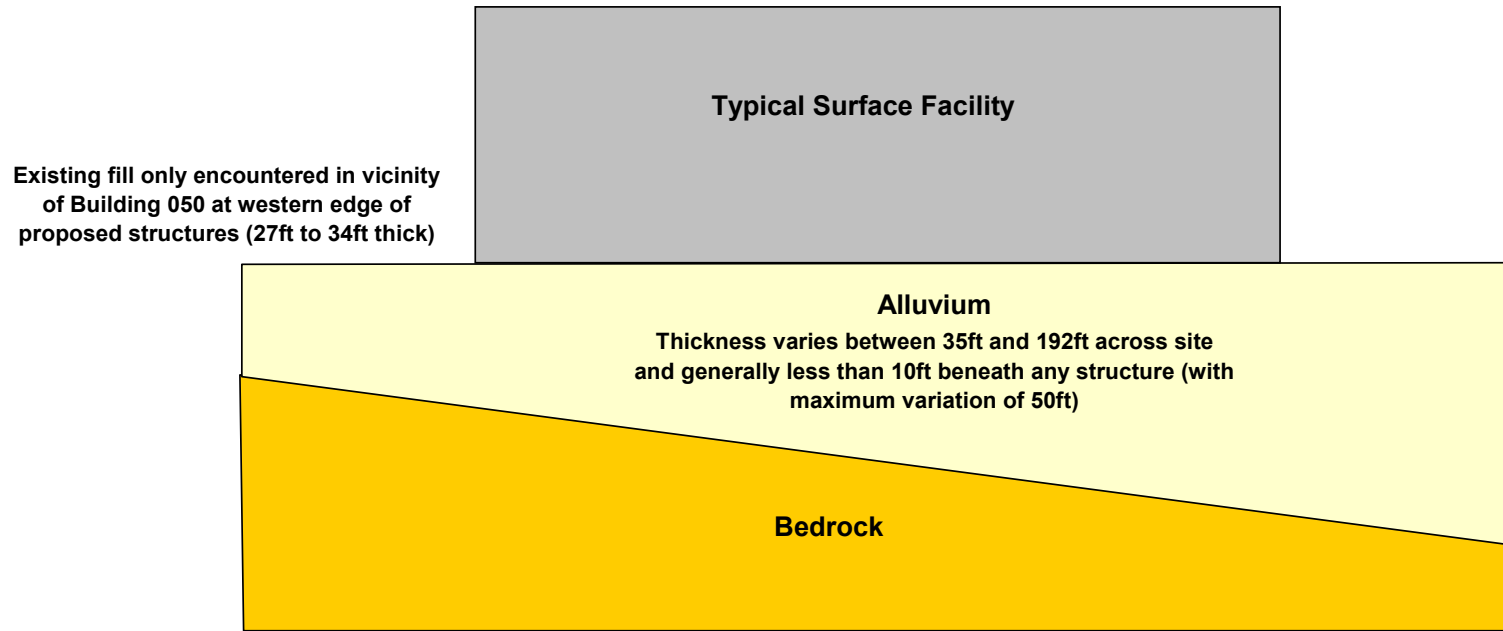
Sketch of Stratigraphy Underlying Typical Surface Facility (not to scale).
